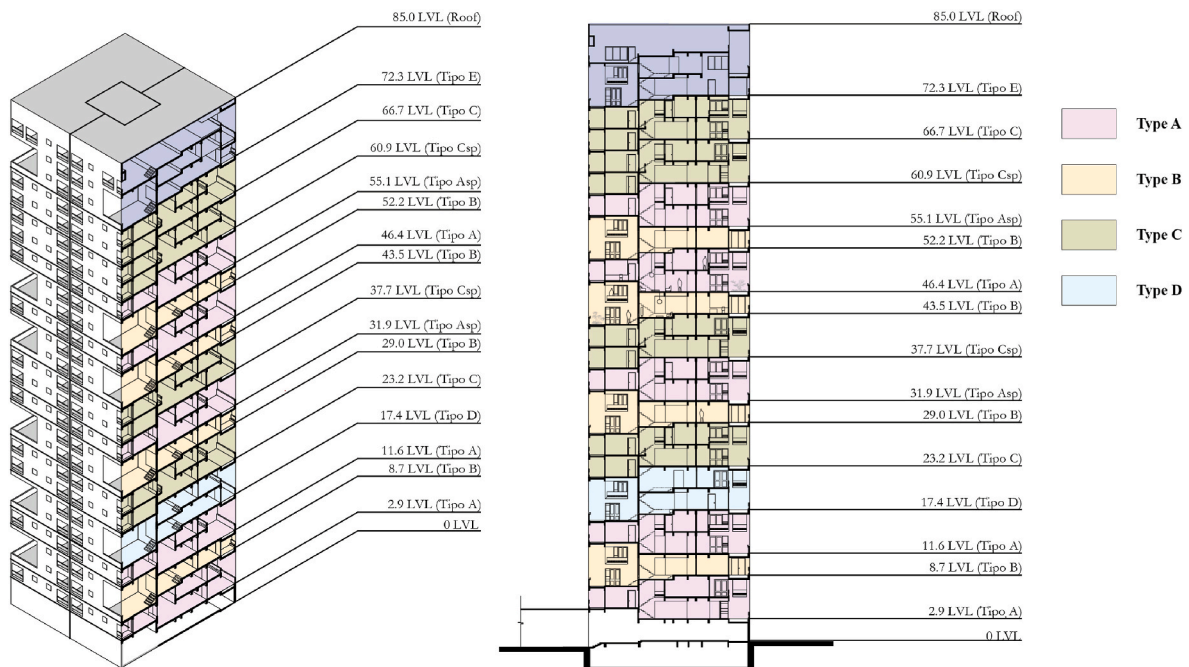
Axonometric cross-section and 2D cross-section of Kanchanjunga Apartments.
